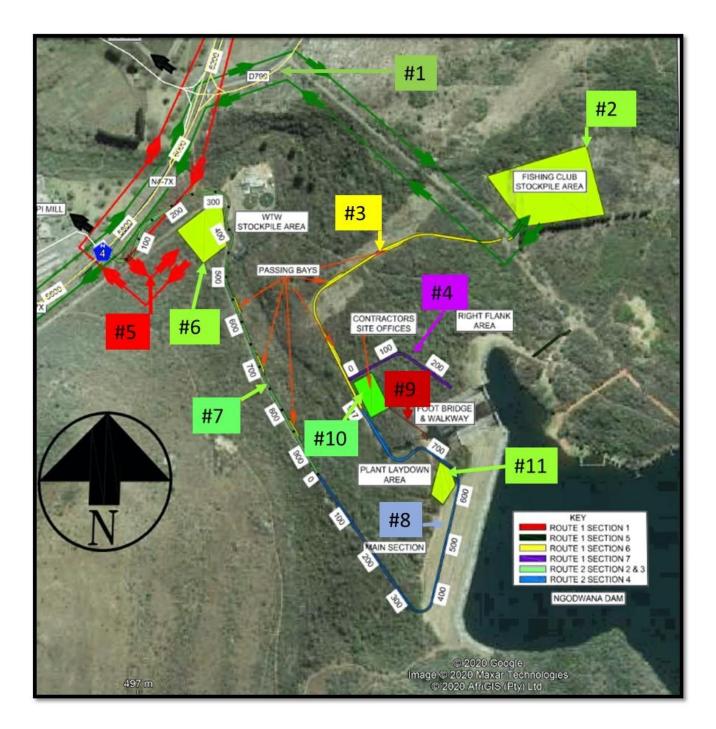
The proposed Ngodwana Dam rehabilitation infrastructure setup, highlighting haul road routes to areas.
